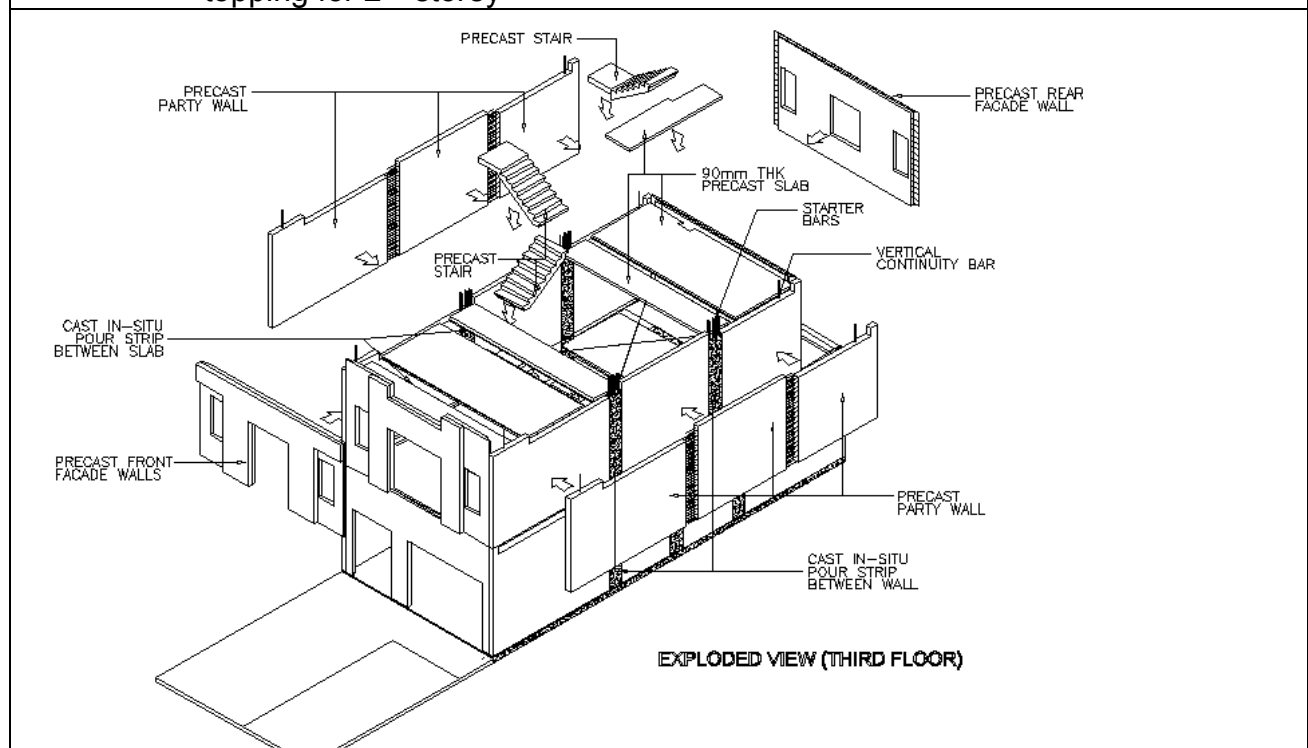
Precast prestressed slabs spanning between walls with composite in-situ topping for 3rd storey
